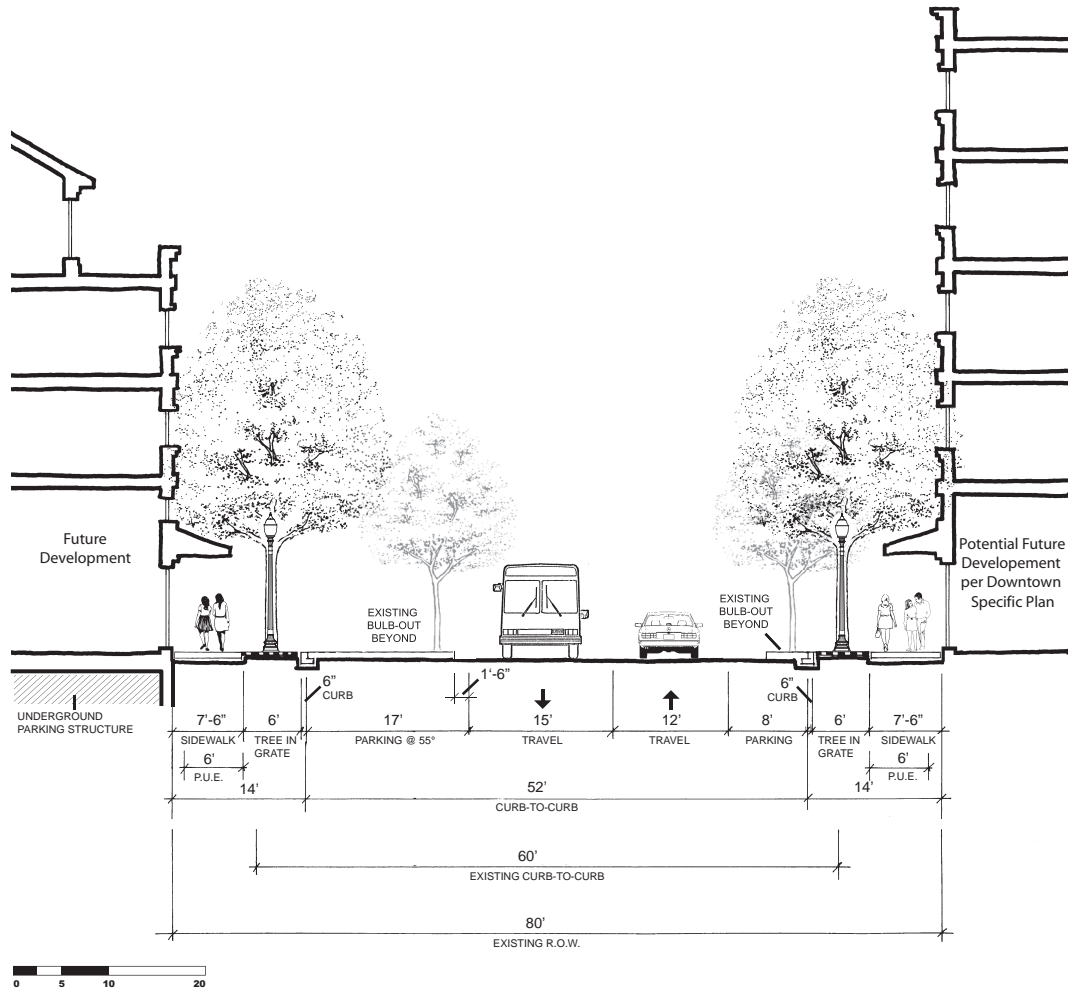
C.36: Santa Clara Street Cross Section (Option 1)
